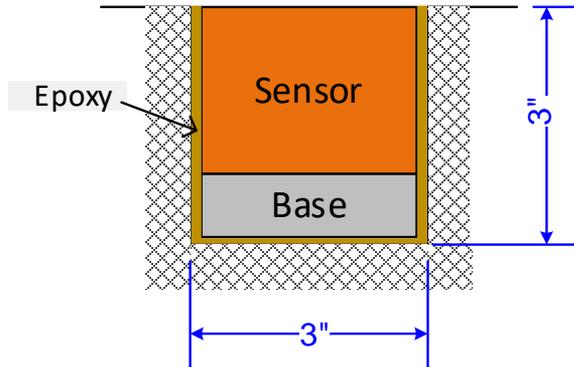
Strain Gauge Strip Sensor Installation Detail
